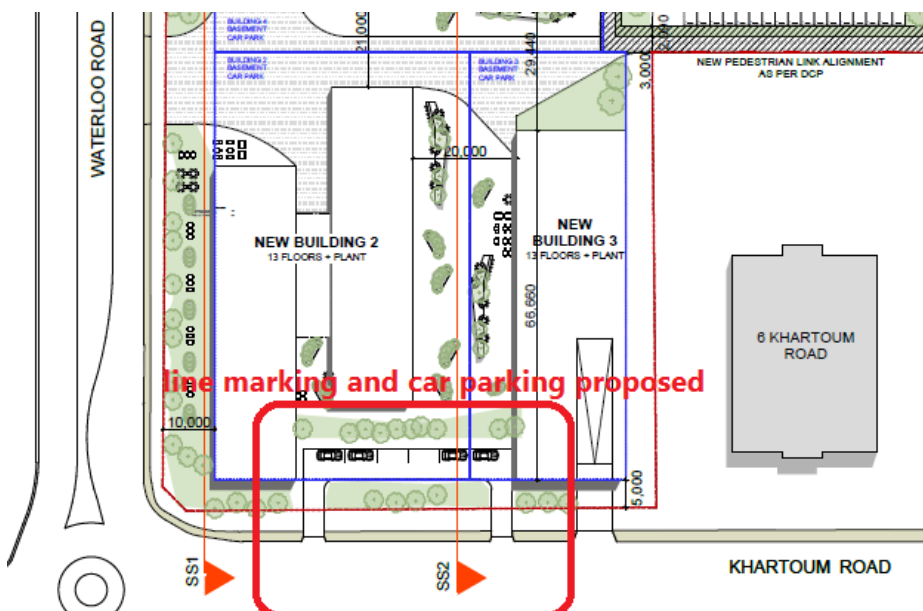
Excerpt of concept DA Plan indicating proposed car parking within the Khartoum Road setback area (Dwg no. DA29, Issue F)
